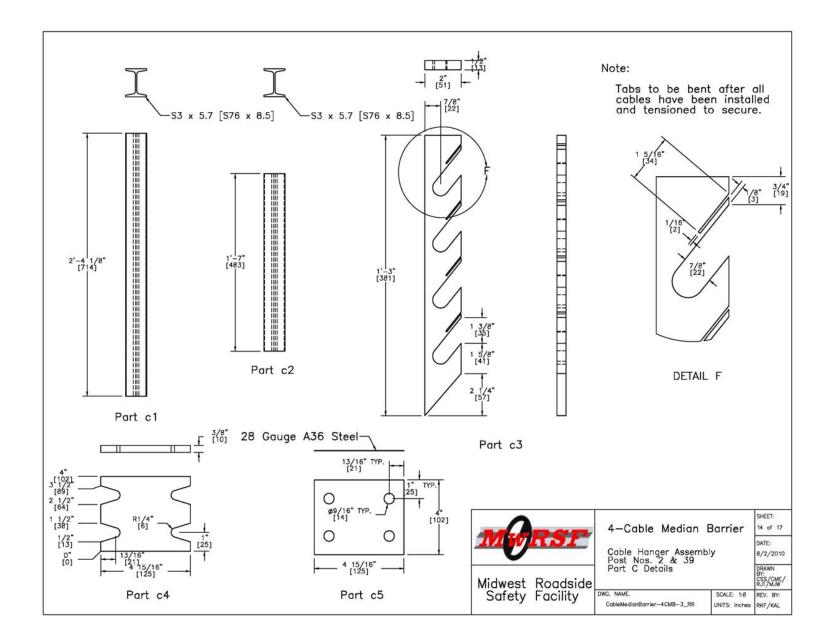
Cable Hanger Assembly Details, Post Nos. 2 & 39, Test No. 4CMB-3
